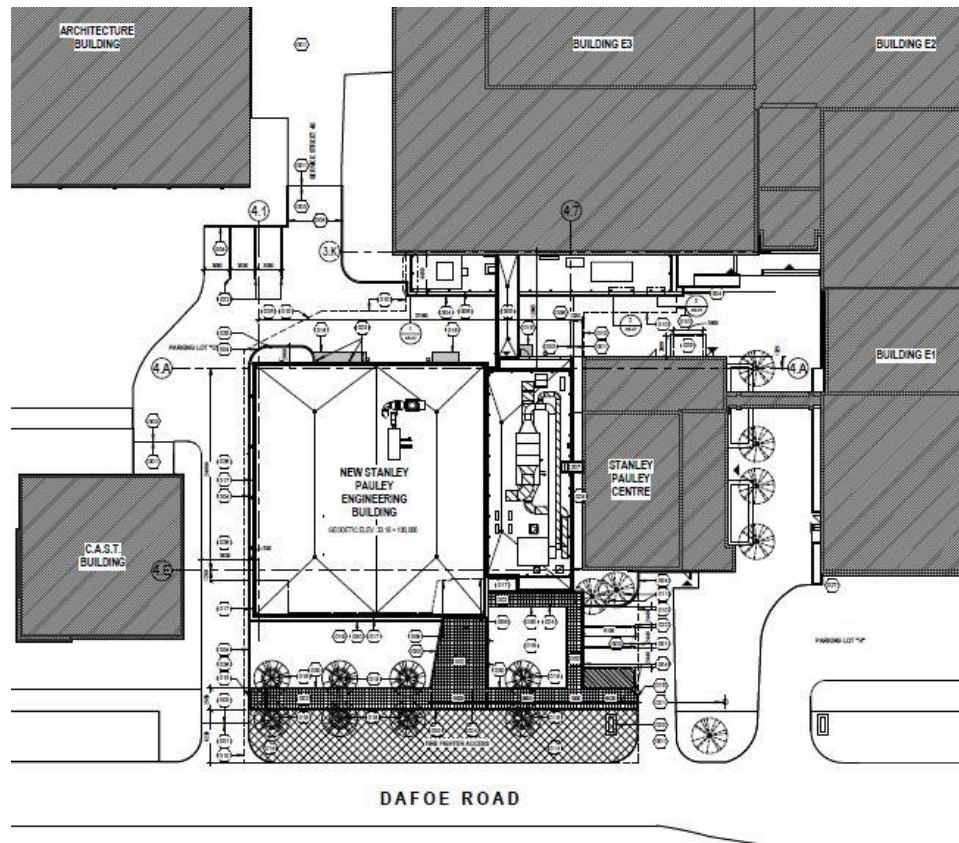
Fragment of campus key plan with Stanley Pauley Building
